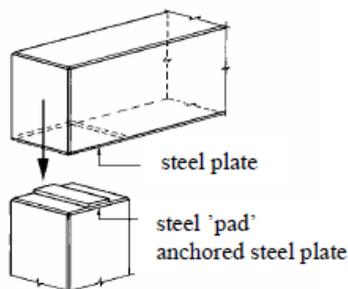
steel plate connection (Du Béton & Engström, 2008)
